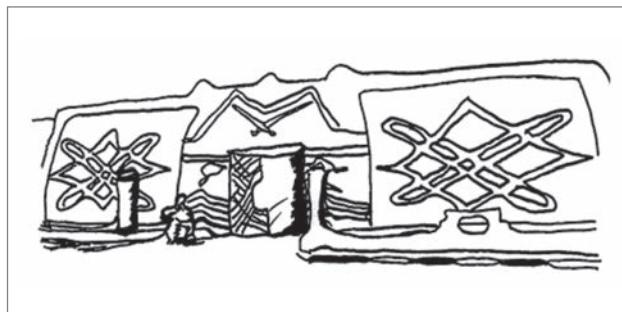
Typical Hausa decorations on walls with entrances (illustration: authors).
